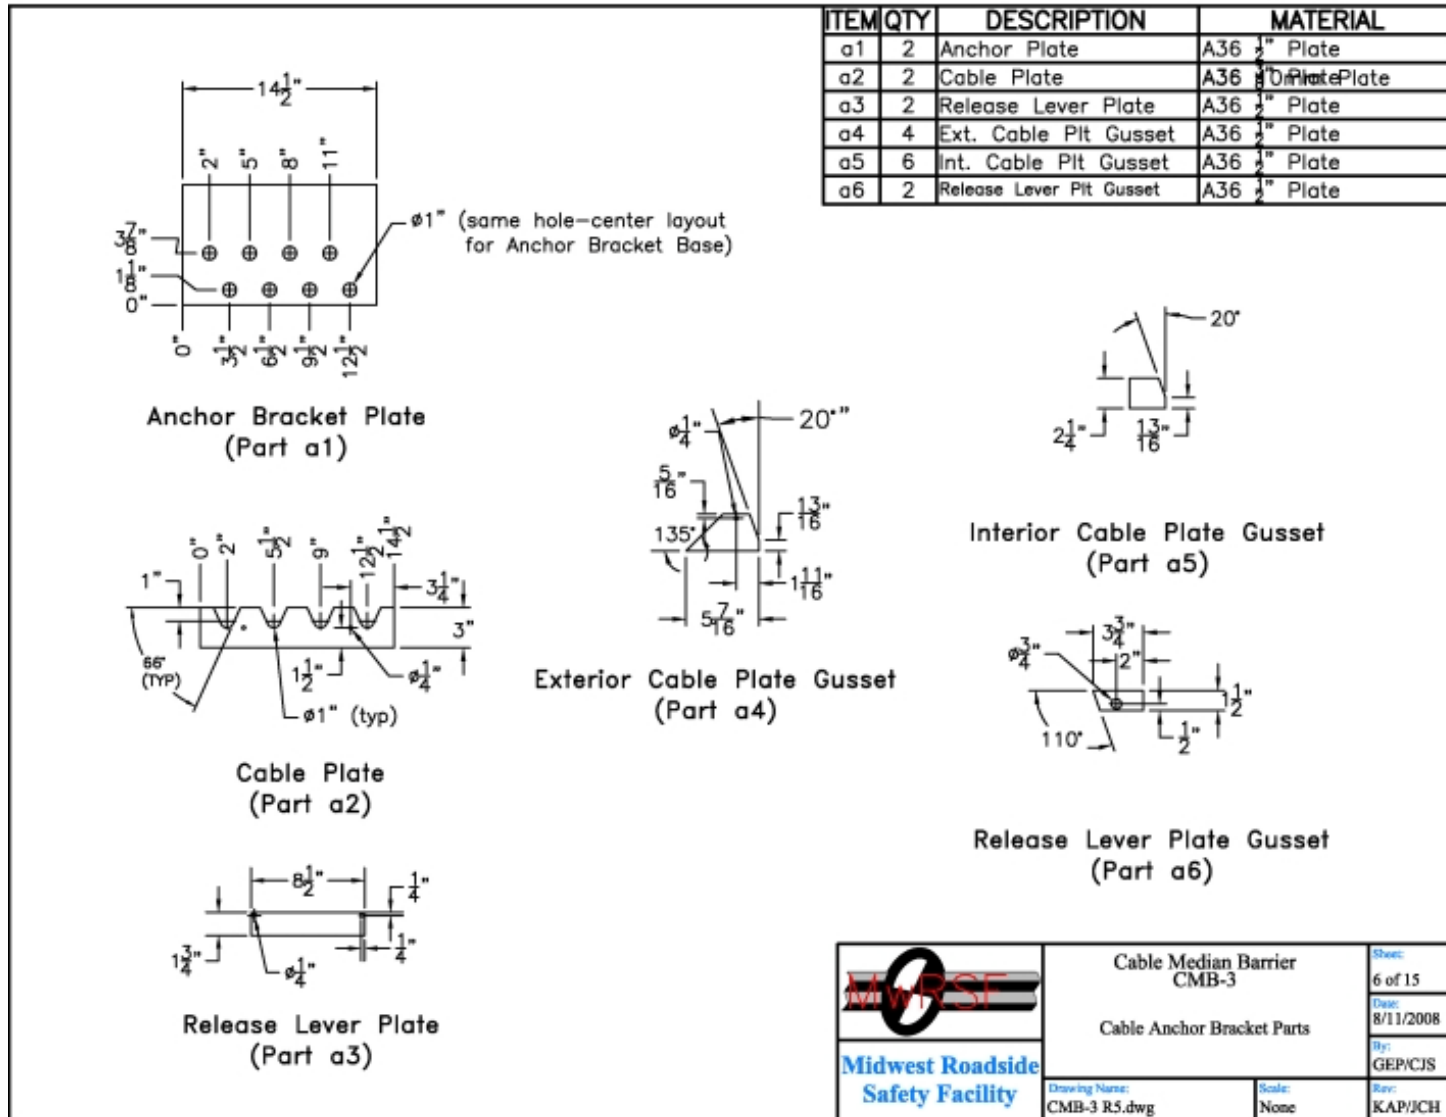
Cable Anchor Bracket Parts (English), Design No. 3
